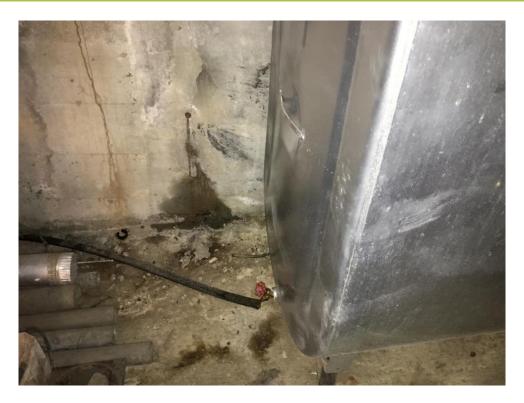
abandoned heating oil AST in the crawl space under the house at 1445 Burnside Rd W
